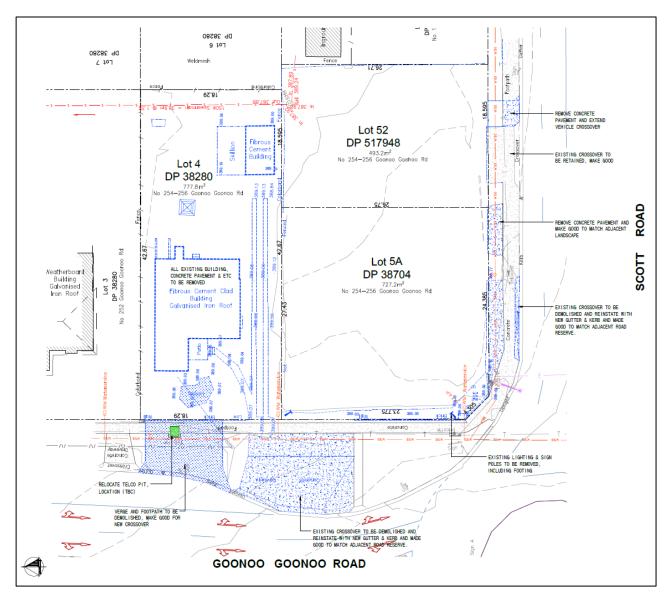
Site Plan - Corner of Goonoo Goonoo Rd & Scott Road South Tamworth.
